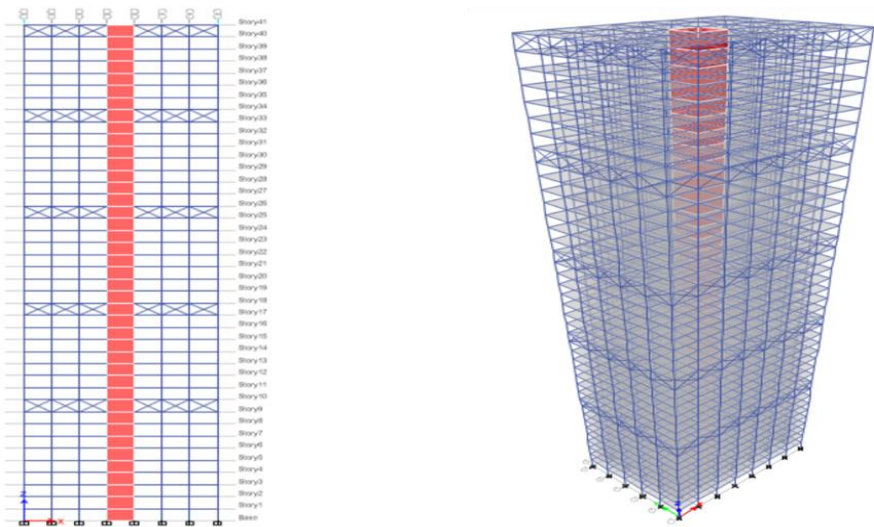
Model of G+40 Building using outriggers by X type bracing positioned at 9th, 17th, 25th, 33th, 41th Story
